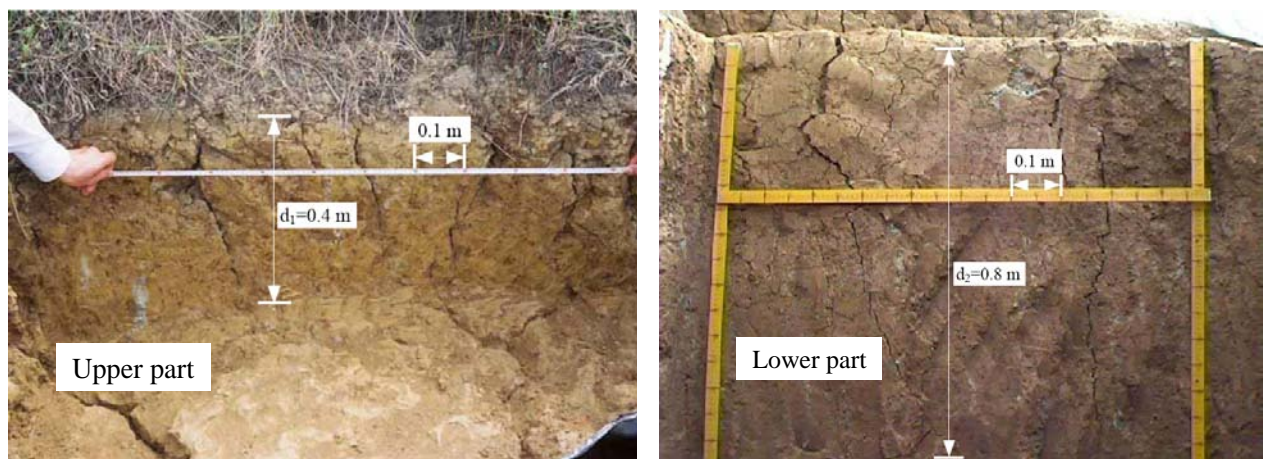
Cracks and fissures observed in a trial pit (Zhan et al., 2007)
